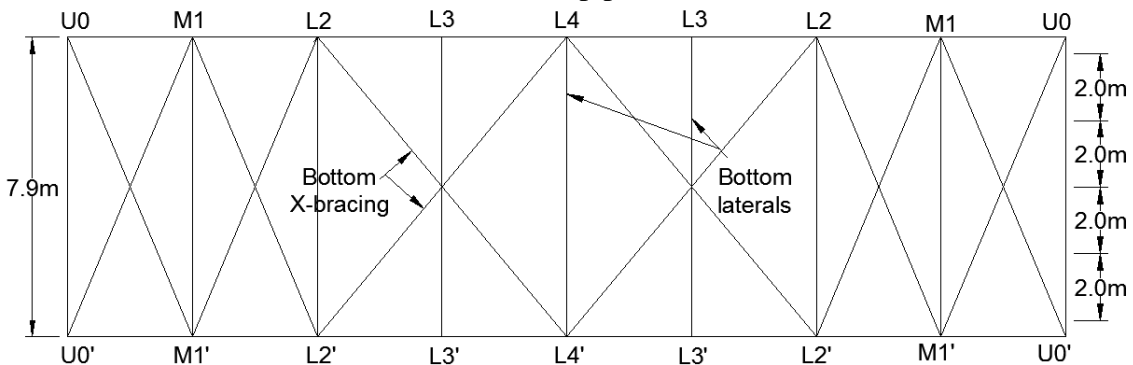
shows the 30.0m span K-type under slung truss bridge. Centre to centre distance between the trusses is 7.9m and height of the truss is 8.5m. Cross girders are spaced at 3.75m and two stringers are spaced at 2.5m c/c. Arrangement of cross girders and stringer beams is same as in case of the deck type truss bridge.
